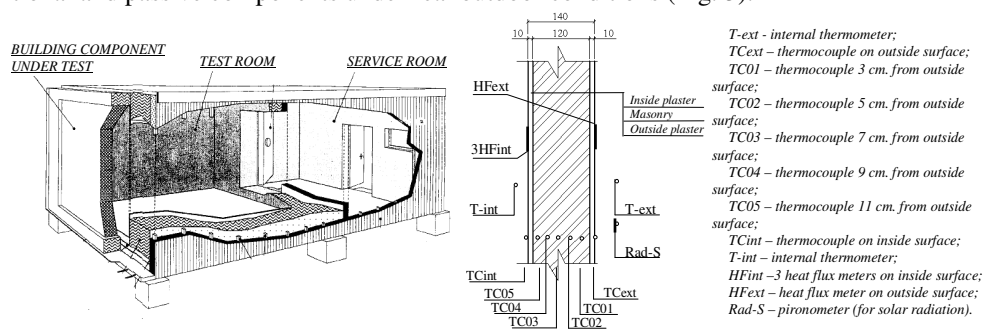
Scheme of a test room and a test component section with installed measuring equipment
